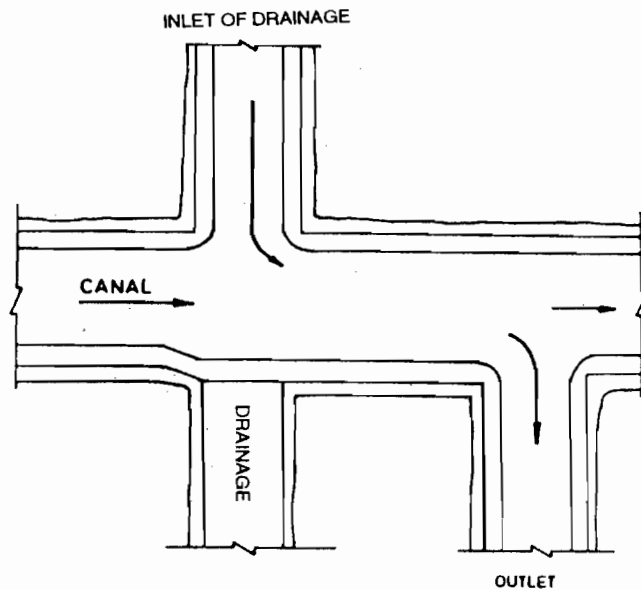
Inlet-Outlet Arrangement as a Cross Drainage Work
